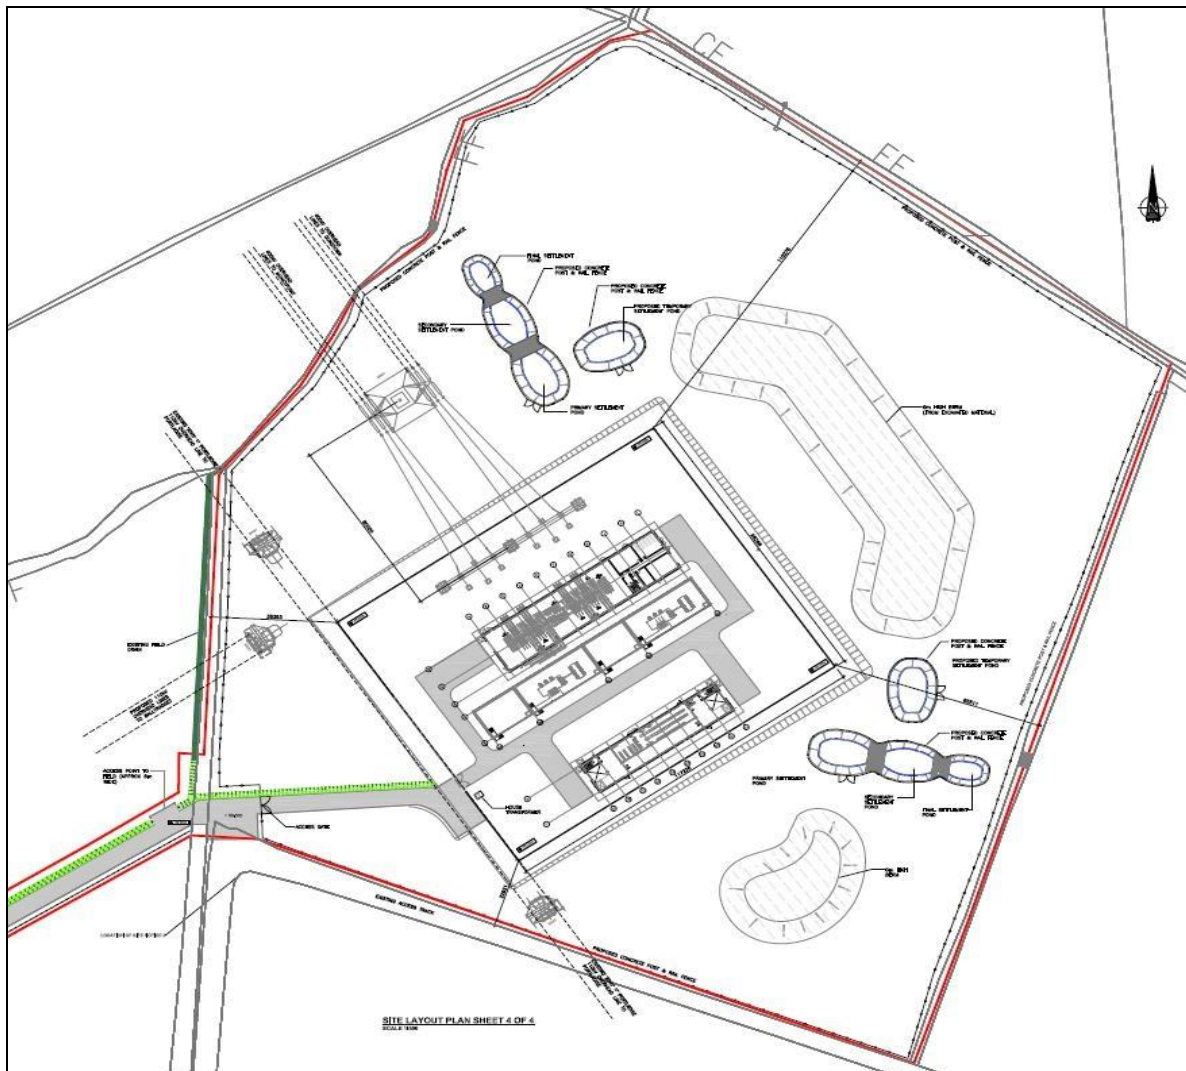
Site Layout of the Proposed Coolnabackey GIS Substation
